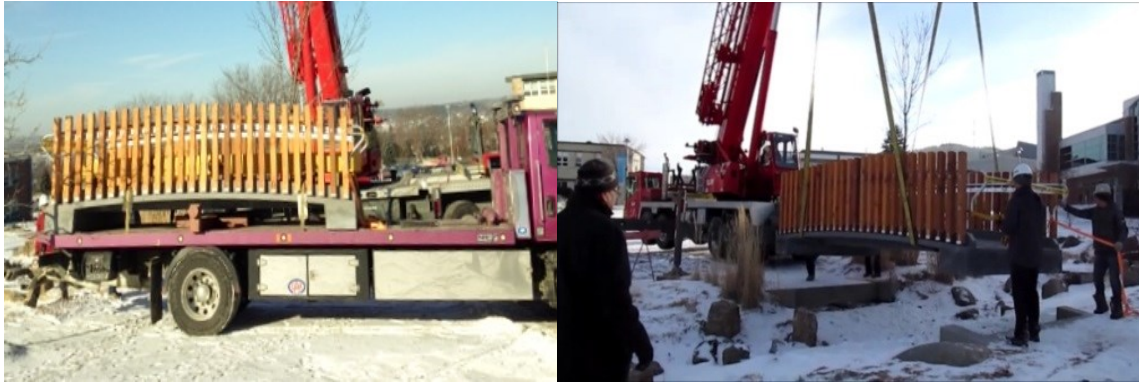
The completed footbridges were transported on a flatbed truck and installed with a truck-mounted crane
